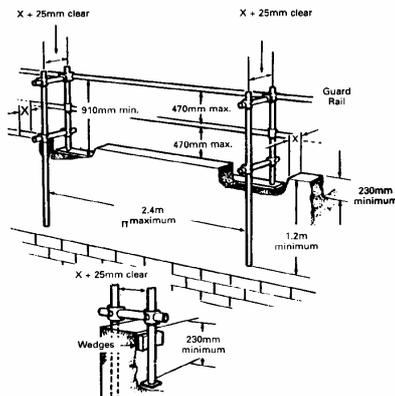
Flat Roof Edge Protection: conventional tube and fitting supported from the ground.
